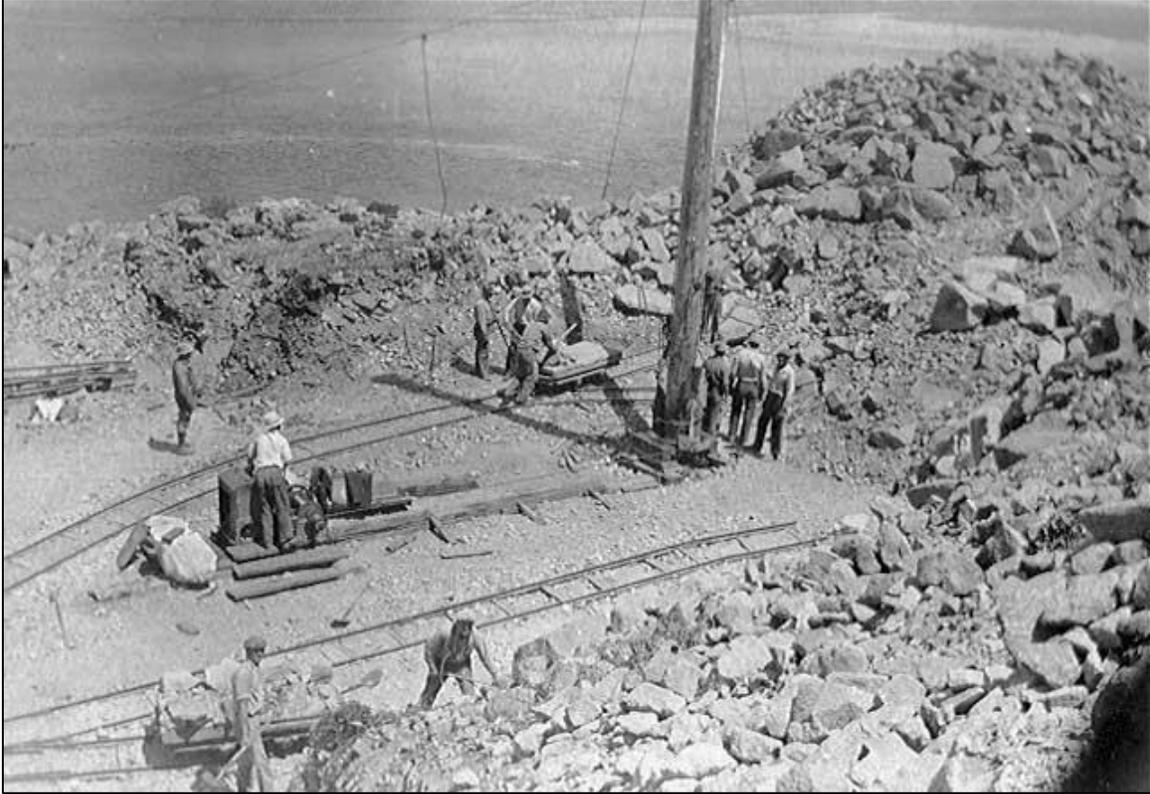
Construction of the causeway to and from Morro Rock in 1936 (oldmorrobay.com).
